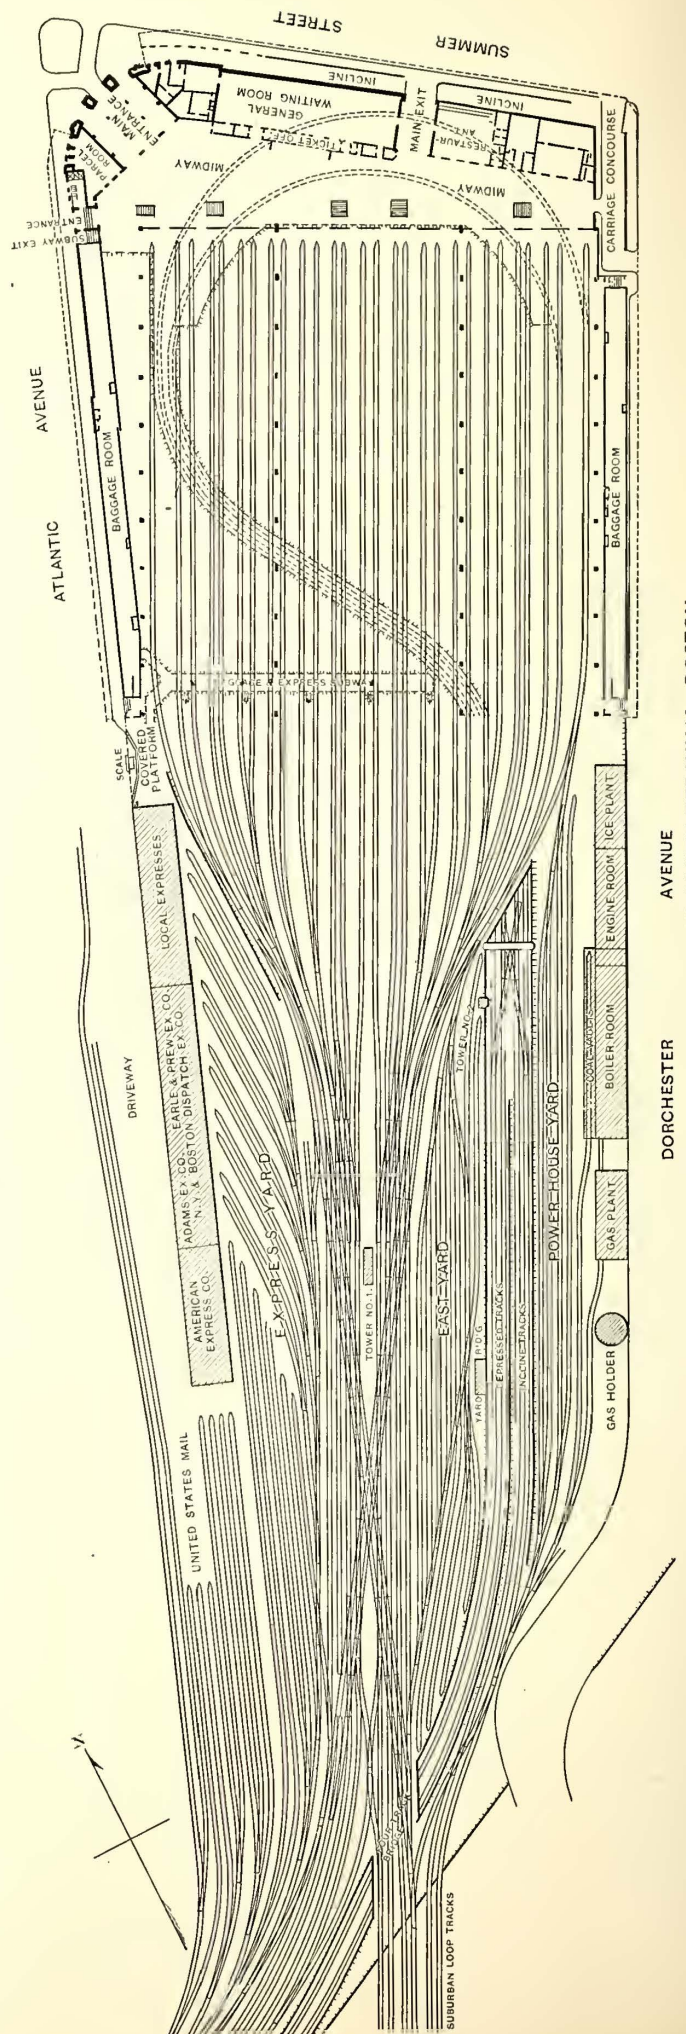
TRACK AND STATION PLAN OF THE NEW SOUTH TERMINAL, BOSTON
